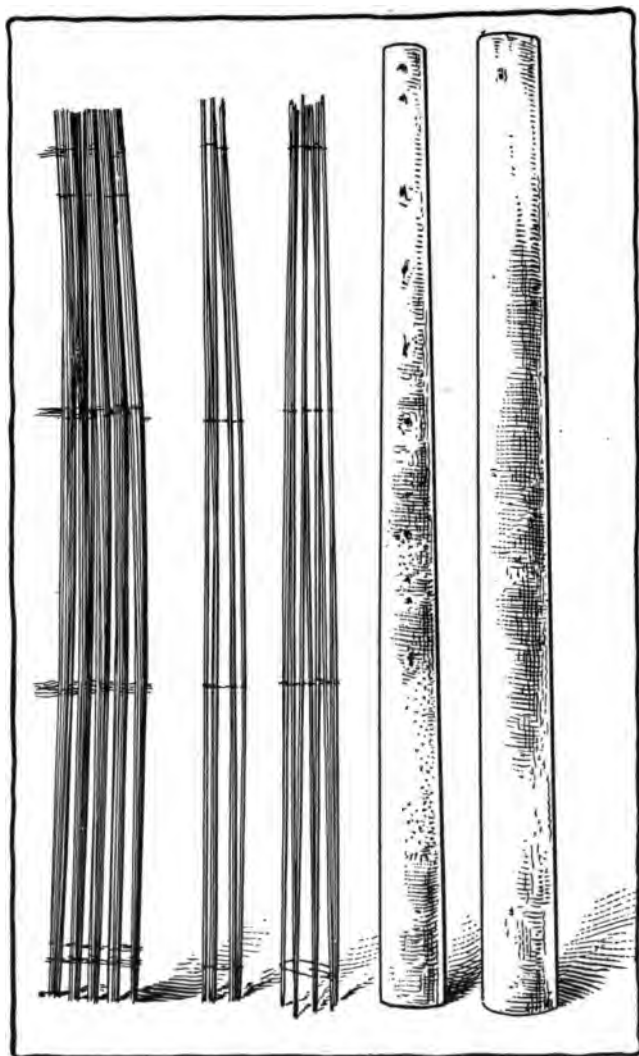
View of Reinforcement for Concrete Posts, Shown
